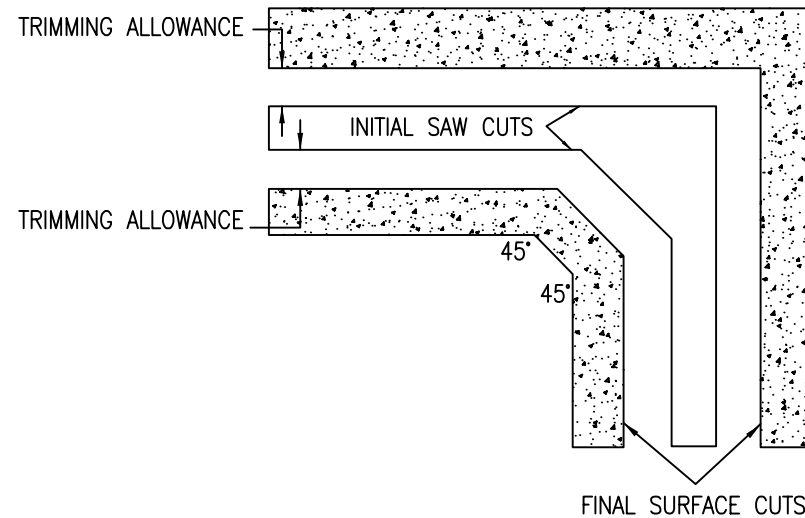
TRENCH EXCAVATION WITH CORNERS
